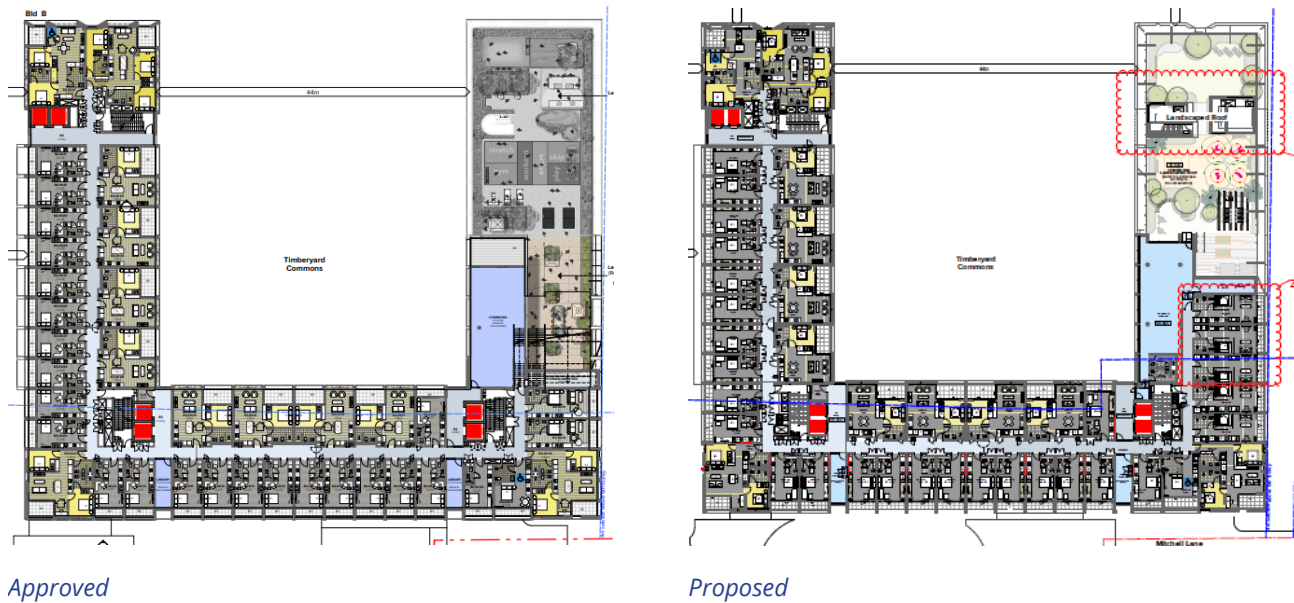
Comparison between approved and proposed Building B Level 9 layout
